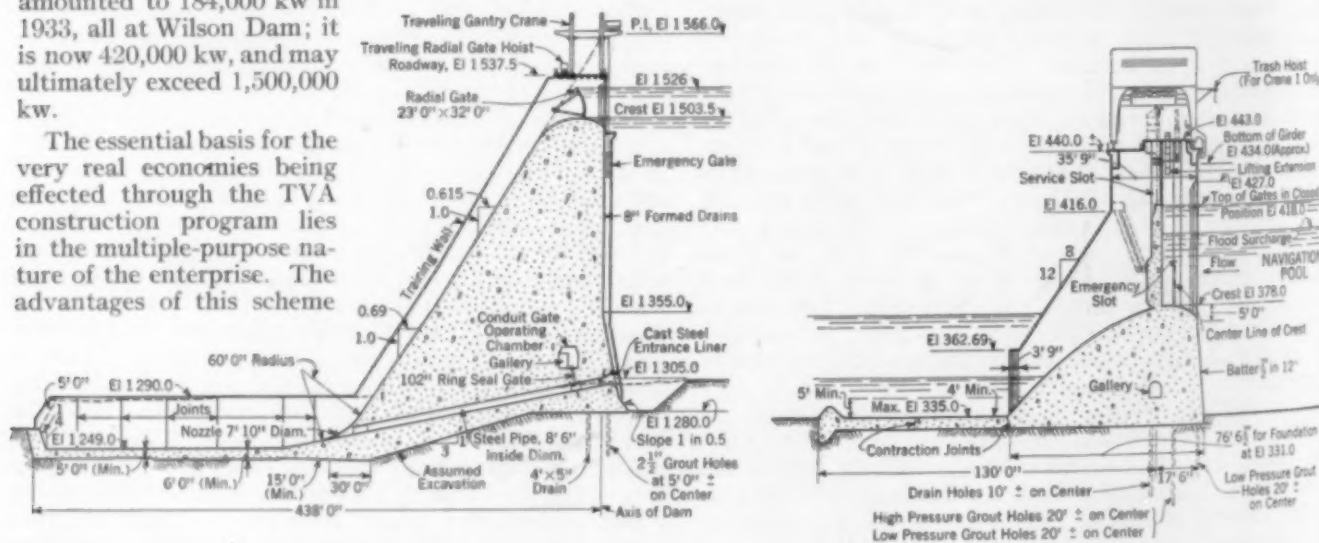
CROSS-SECTIONS OF TYPICAL TVA DAMS
